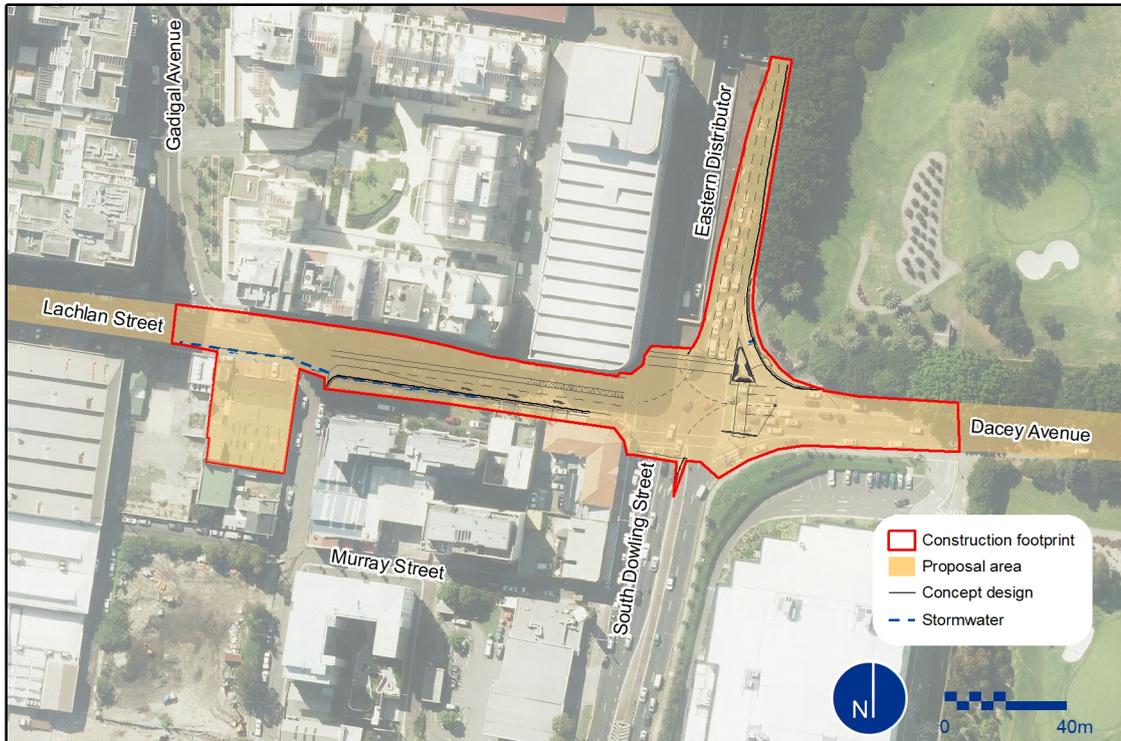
Lachlan Street, South Dowling Street, and Dacey Avenue
